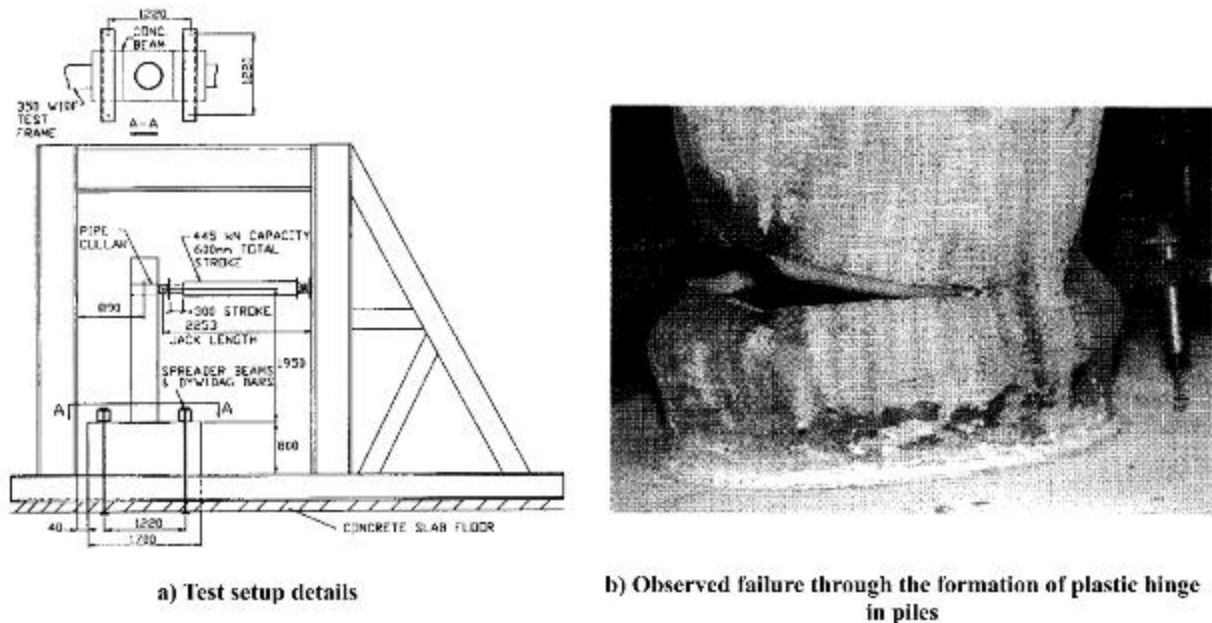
Figure showing test setup details and observed failure in piles, Steunenberg et al. (1998)
